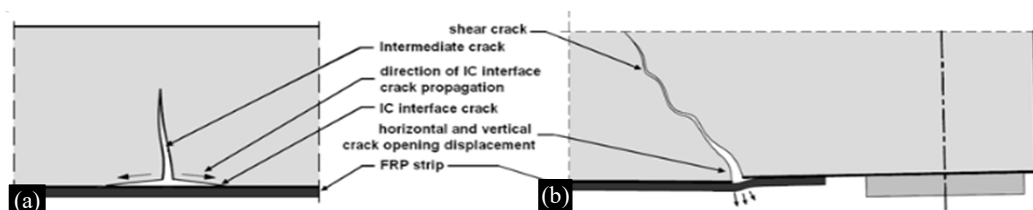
a) Intermediate crack debonding b) Horizontal and vertical crack opening displacement in a shear crack.
